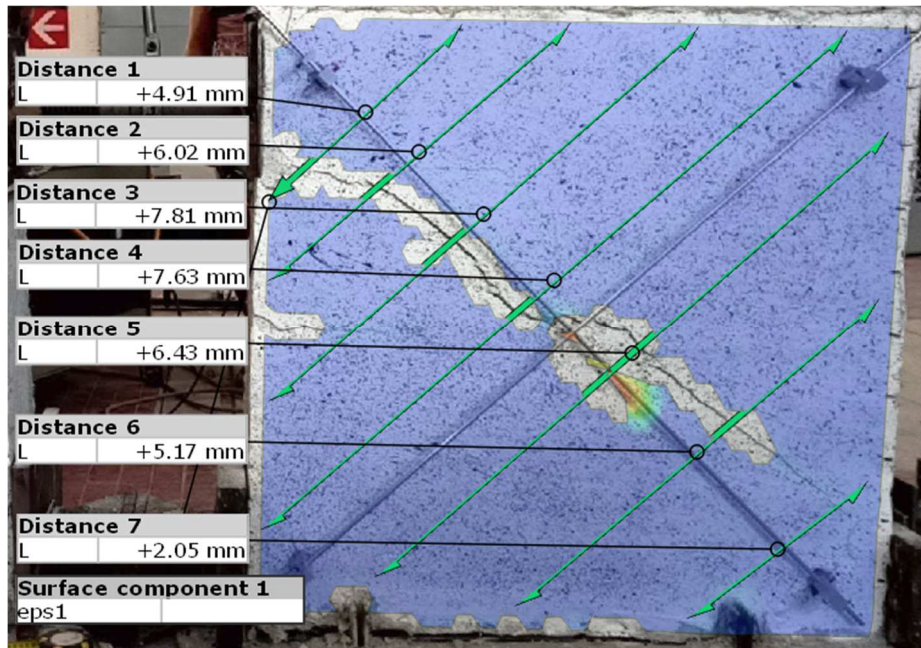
DIC analysis of the retrofitted masonry wall HBW5, when maximum crack or opening observed.
